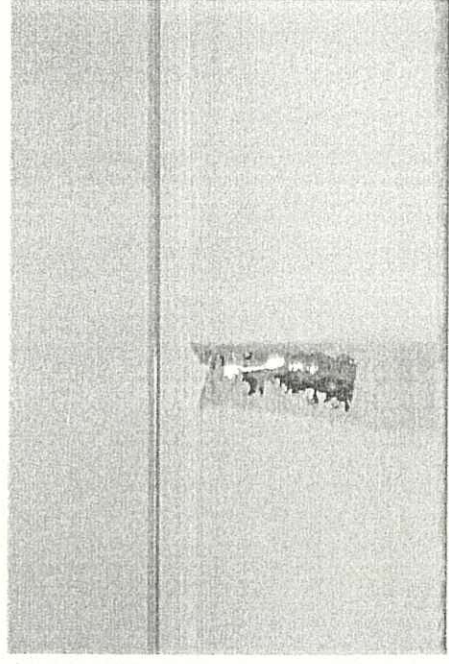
Some Sealant between the Parapet Walls was Damaged
